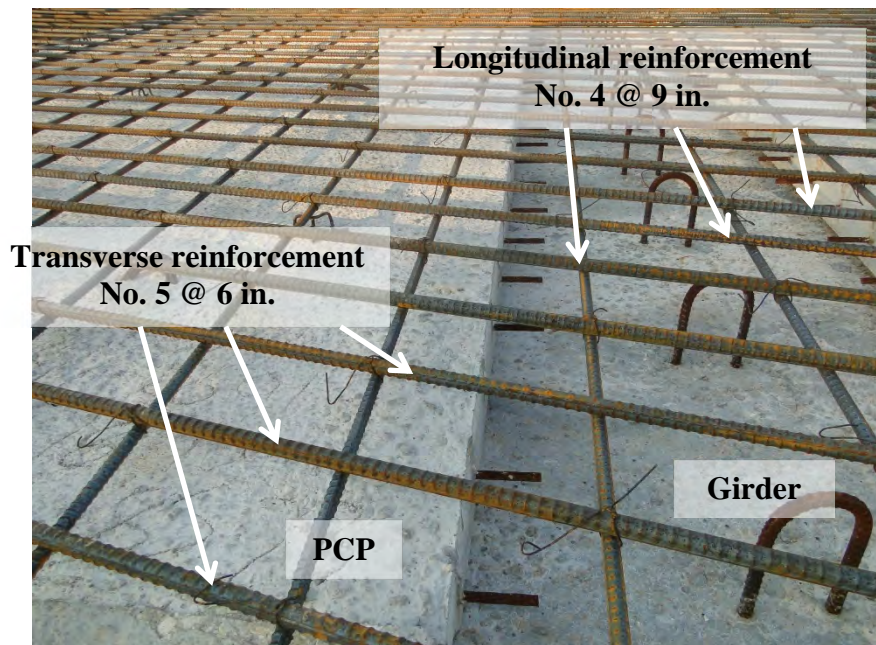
Typical placement of current TxDOT standard reinforcement, Lampapas River Bridge
